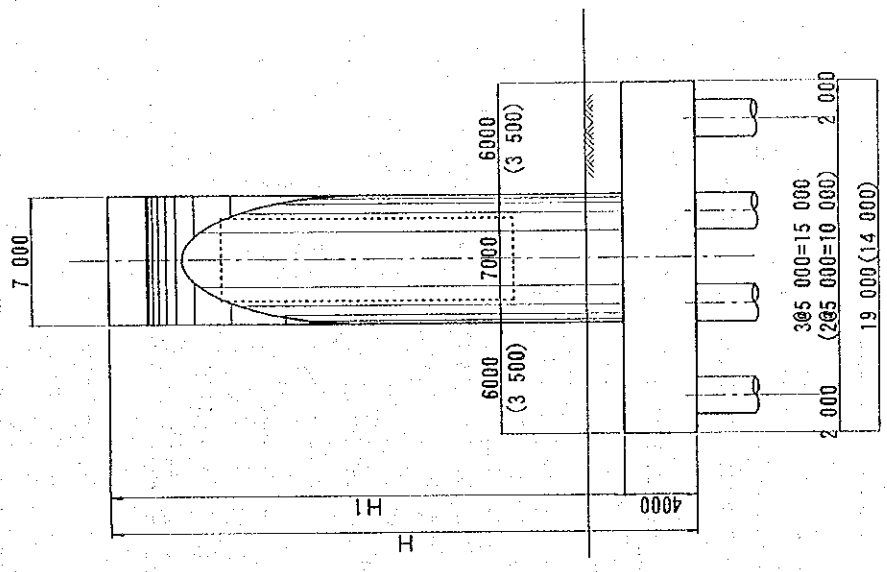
Alternative 1 PC Continuous Box Girder
